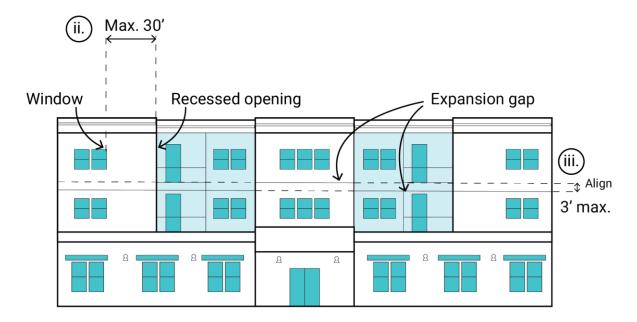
(B)(5)(a)(iii): Building element alignment
